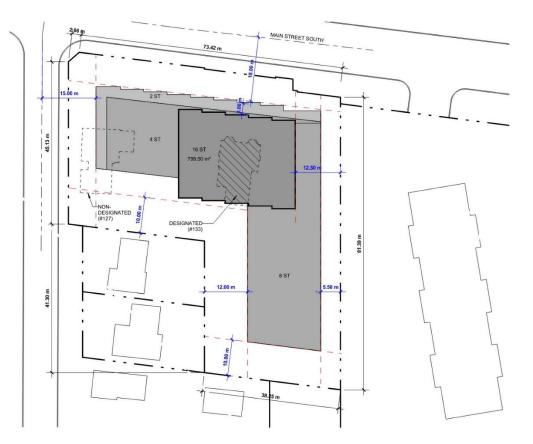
Preliminary building footprint showing existing dwelling locations (source: Amico Properties)
